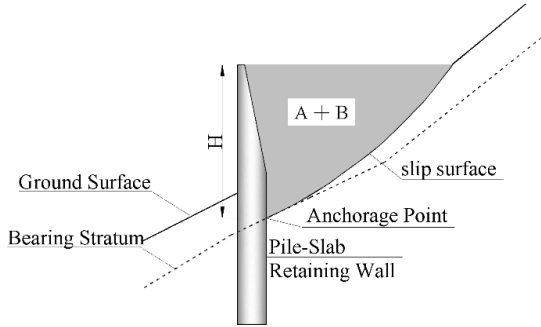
Earth Pressure Distribution in Pile-Slab Retaining Walls
